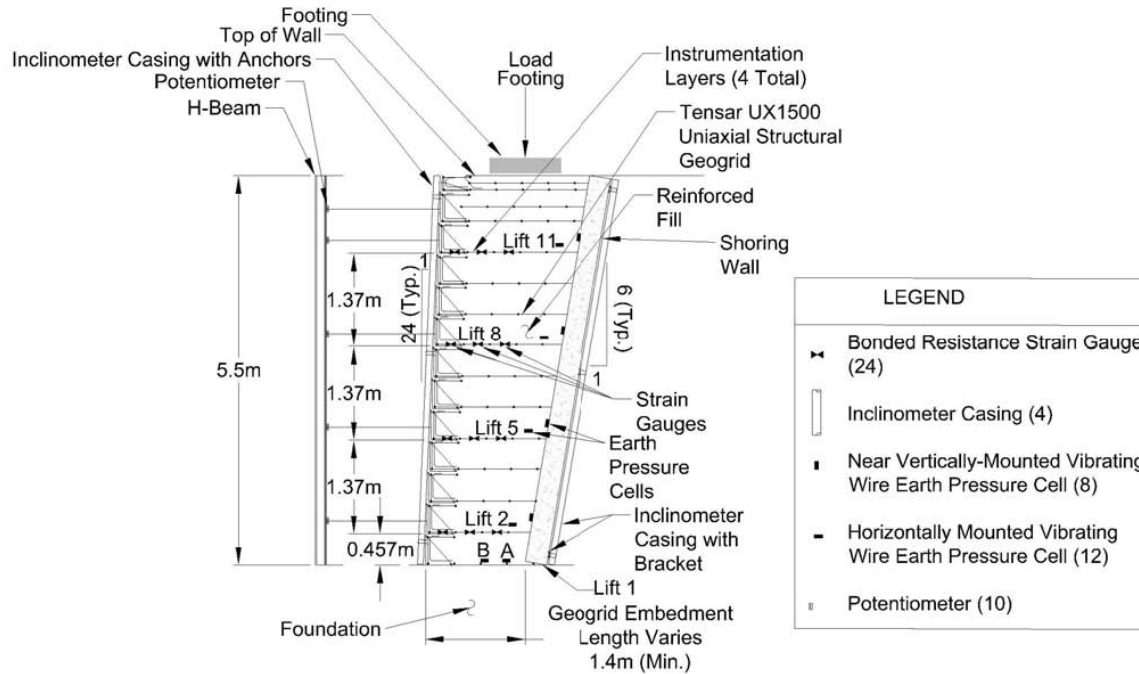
Schematic of the instrumented wall cross-section (Morrison et al., 2006)
